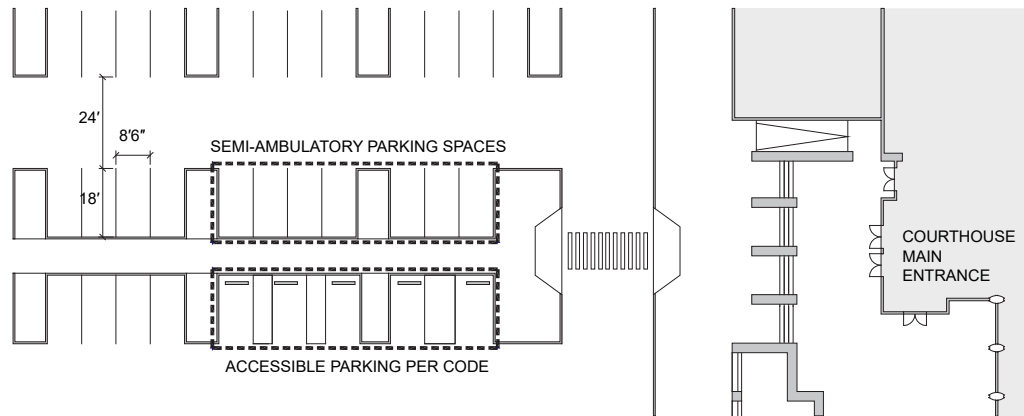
Parking Layout Showing Location of Accessible and Semi-ambulatory Spaces
